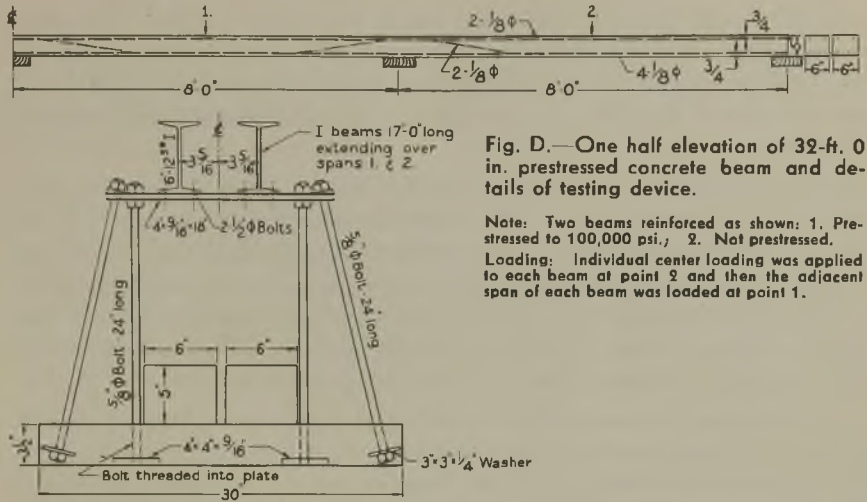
Fig. D.—One half elevation of 32-ft. 0 in. prestressed concrete beam and details of testing device.
